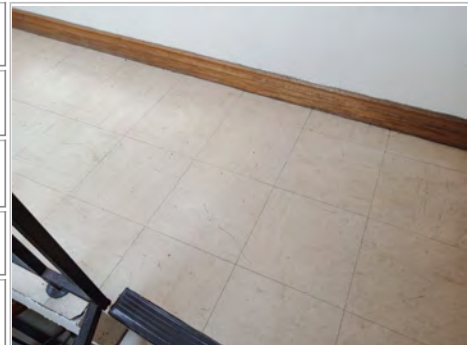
Vinyl floor tiles (beige) on solid floor (as sample GU000230)
